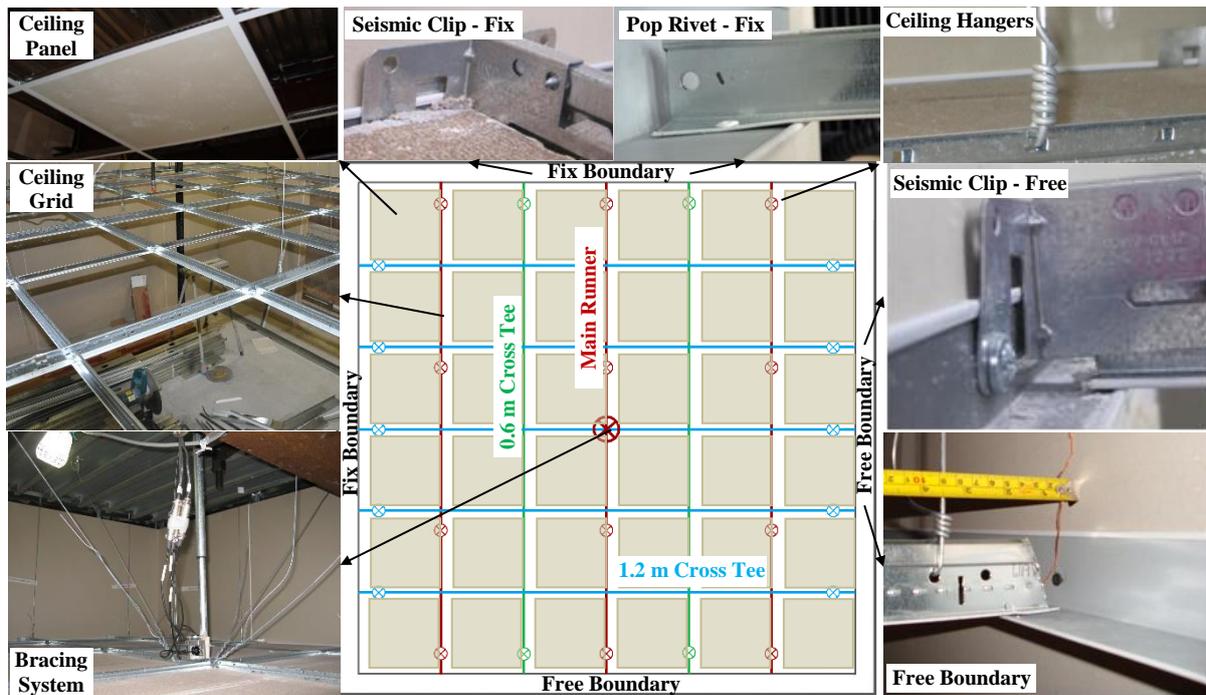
Typical layout and elements of an acoustical lay-in suspended ceiling system.
